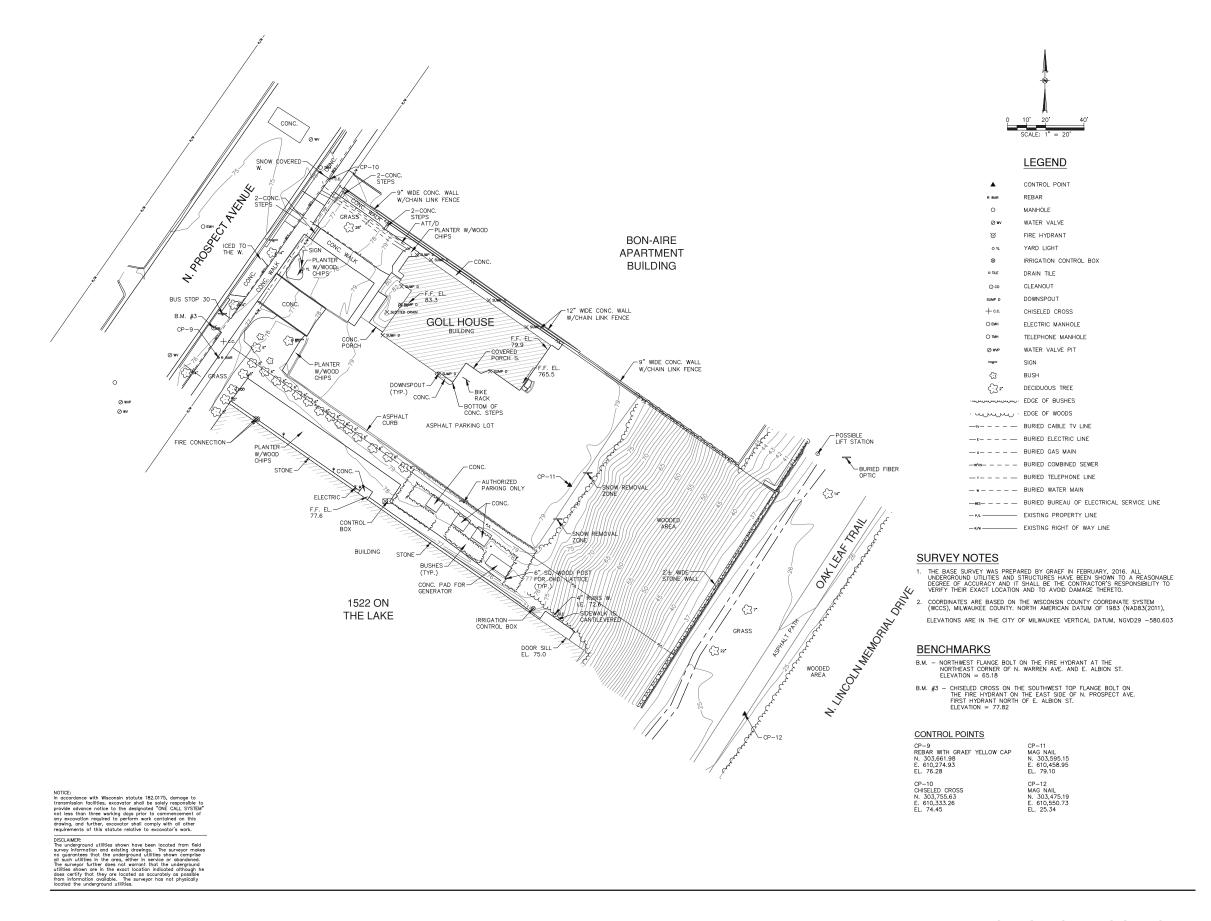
DETAILED PLANNED DEVELOPMENT - REVISED SUBMISSION
